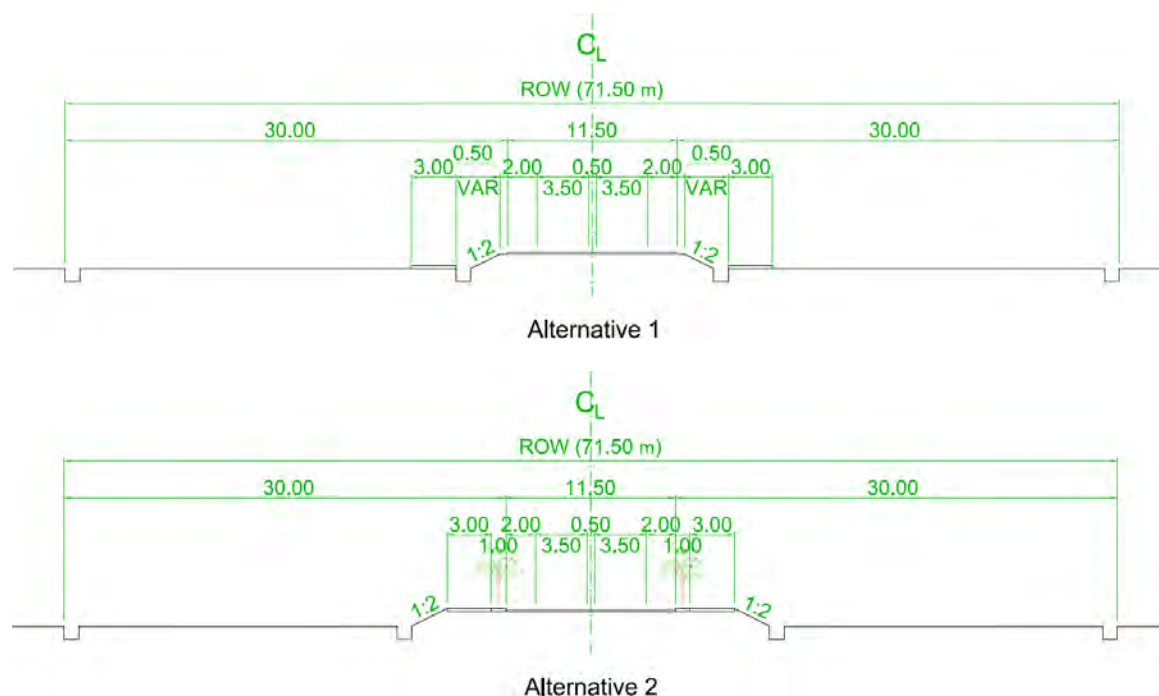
Typical Cross Sections for Cuamba Bypass Road
